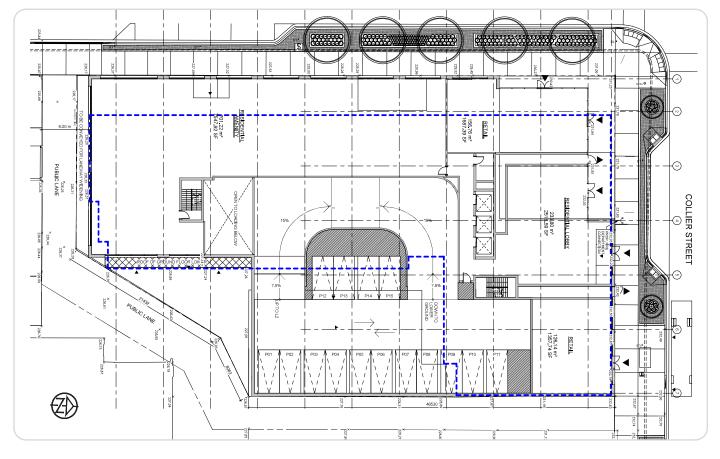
Upper Ground Floor Plan, prepared by Scott Shields Architects Inc.
